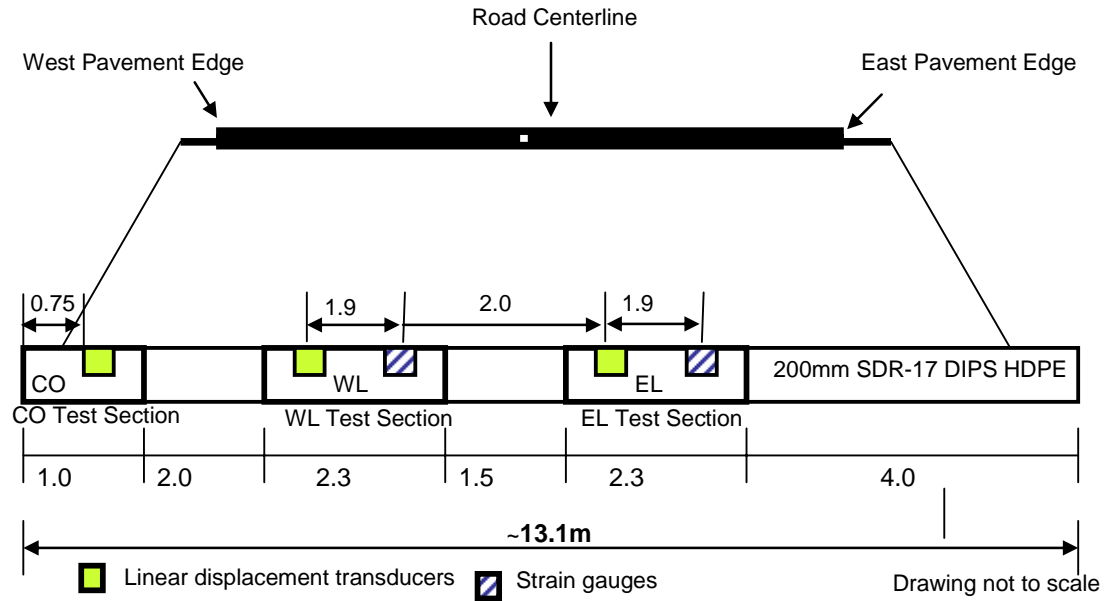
Layout of the sensors placed inside the Open cut installed HDPE pipe
